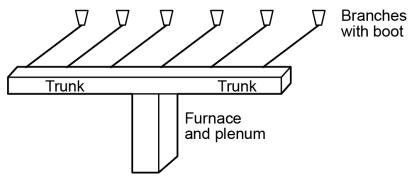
Trunk and branch (two-way system). (Skilled Trades BC, 2021) Used with permission.
